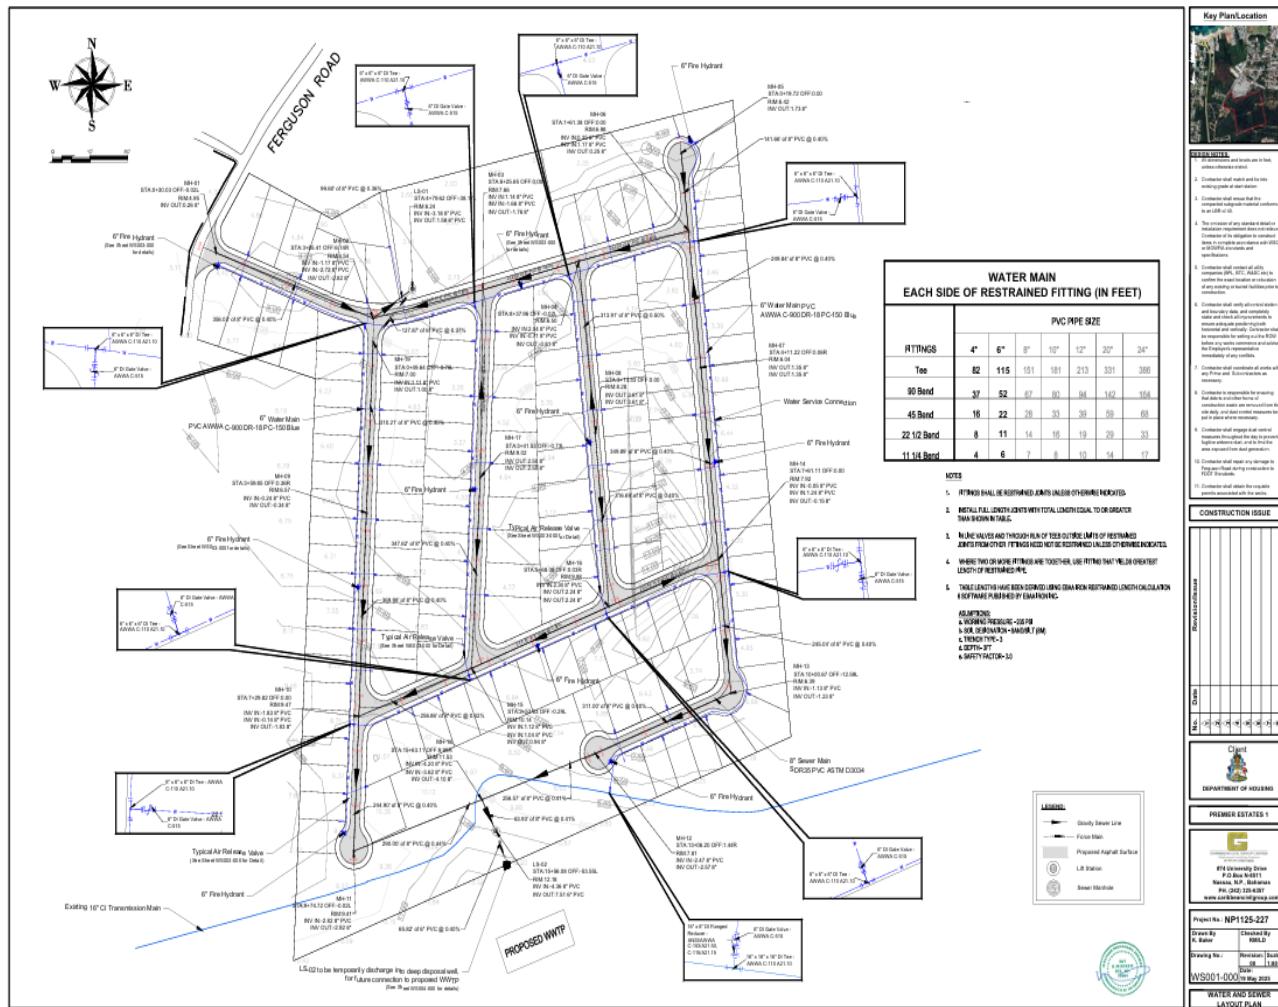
Depicts road reservations, water mains, laterals, with sewer lines, and location of waste water treatment plant (WWTP) within subdivision (Source: CCG 2025)
